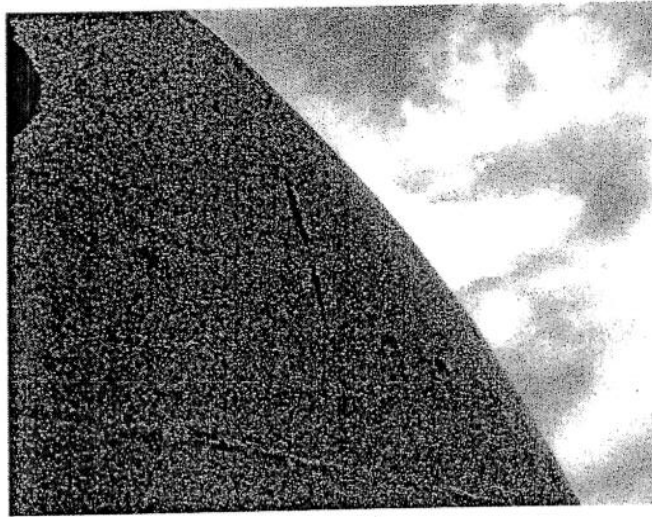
Exterior Coating System on the sidewall shows failure and flaked coatings.
